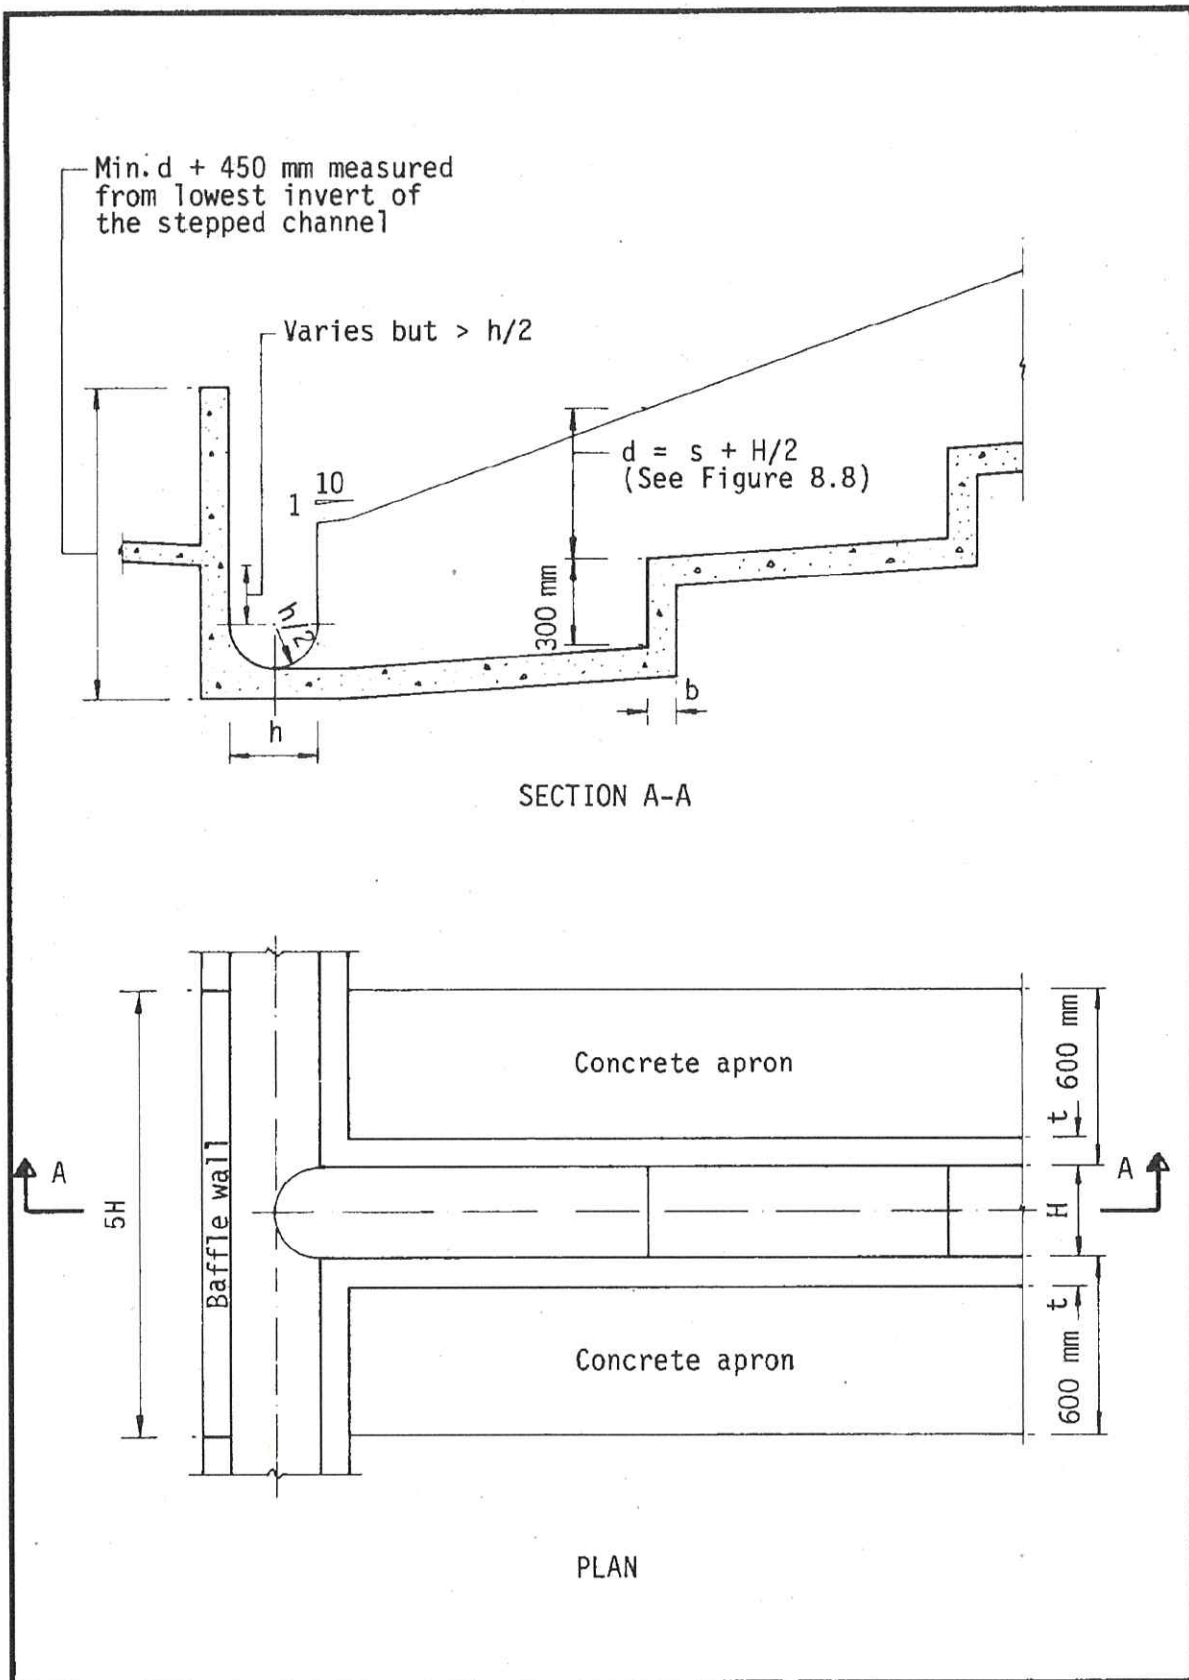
Typical Details of Junction of Stepped Channel and U-channel at Toe of Slope
